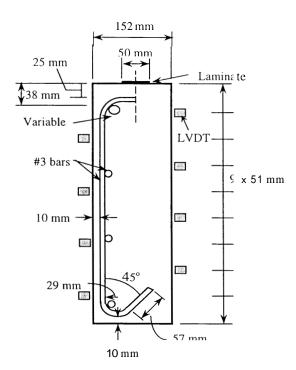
Beam cross-section showing stirrups at shear span and LVDTs at midspan
